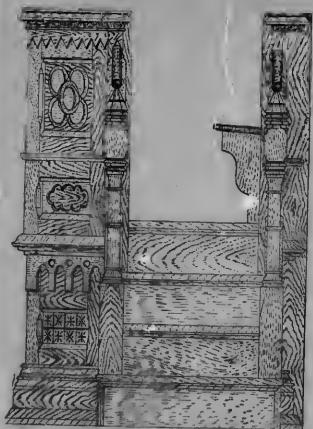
Side Elevation of Pulpit (above Church Floor)
